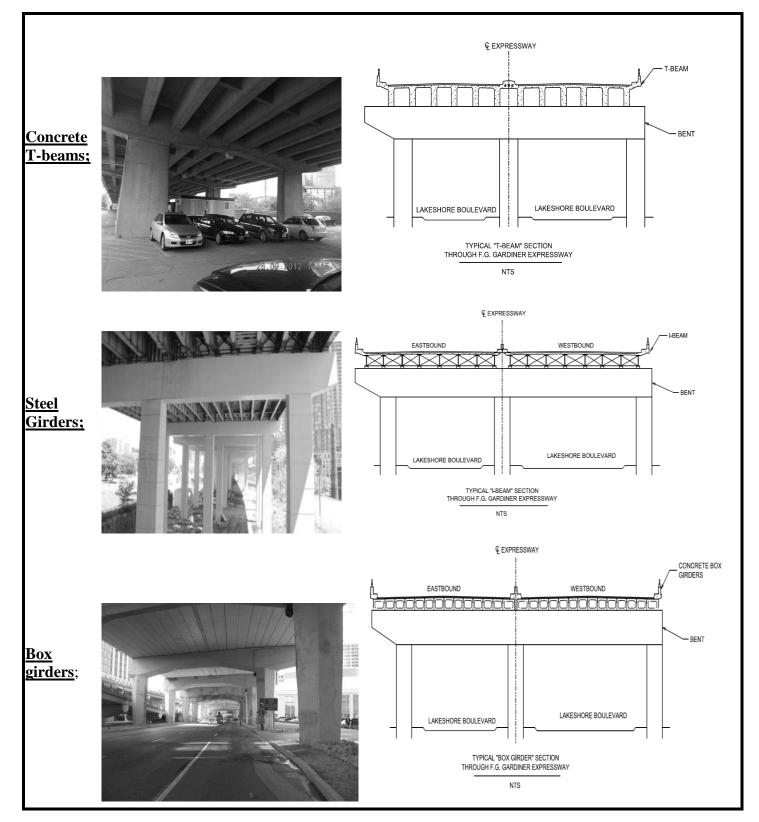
Typical Steel Girder Cross-Section of Elevated Expressway
